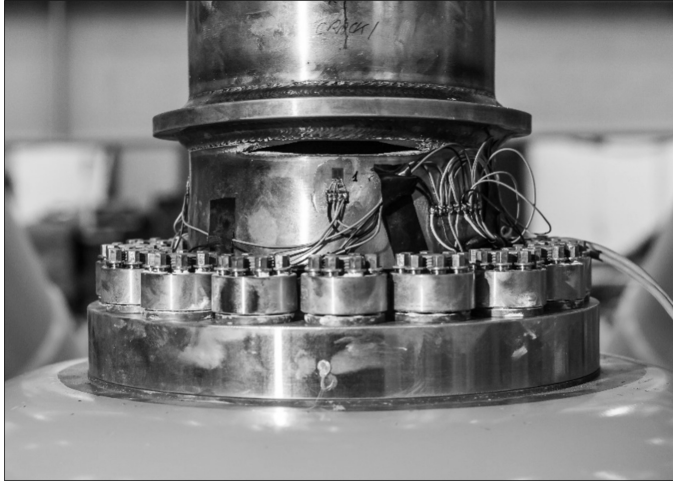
Specimen in hexapod after fatigue failure with through-thickness crack.
